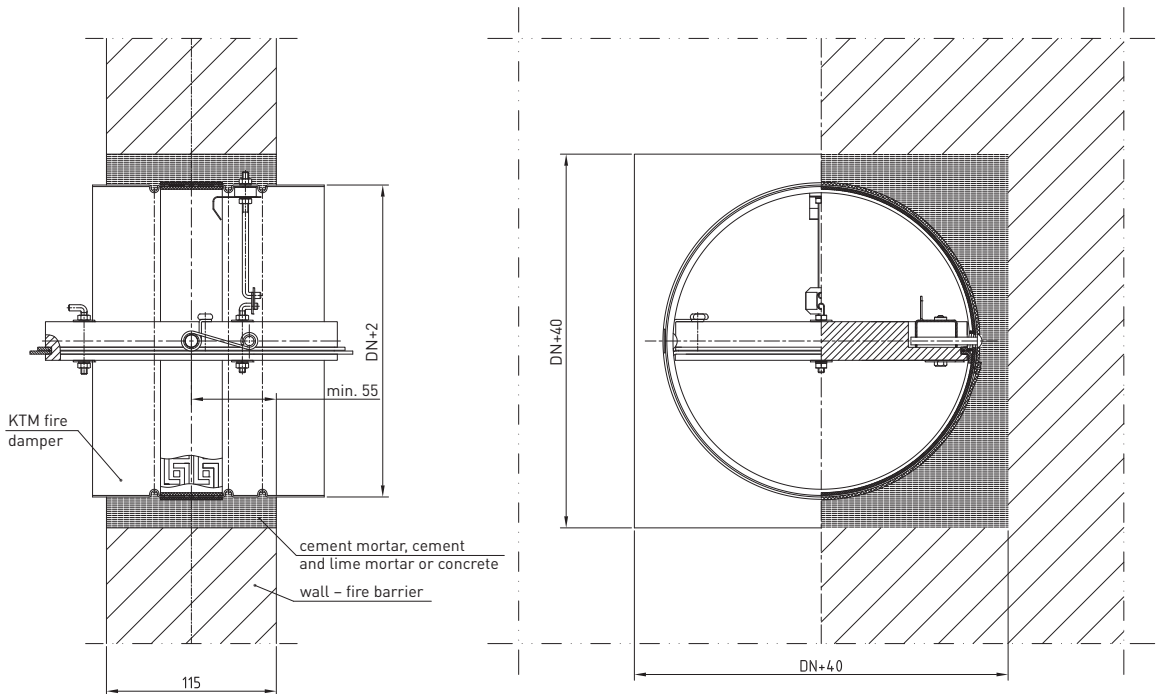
Installation of KTM fire damper (female coupling) in rigid wall barrier – variant I.
